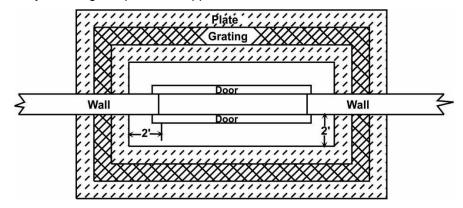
Arrangement Of Trench Drains To Protect Fire Openings (1 ft = 0.305 m). Note that the trenches do not pass through or under the wall and are drained independently.
